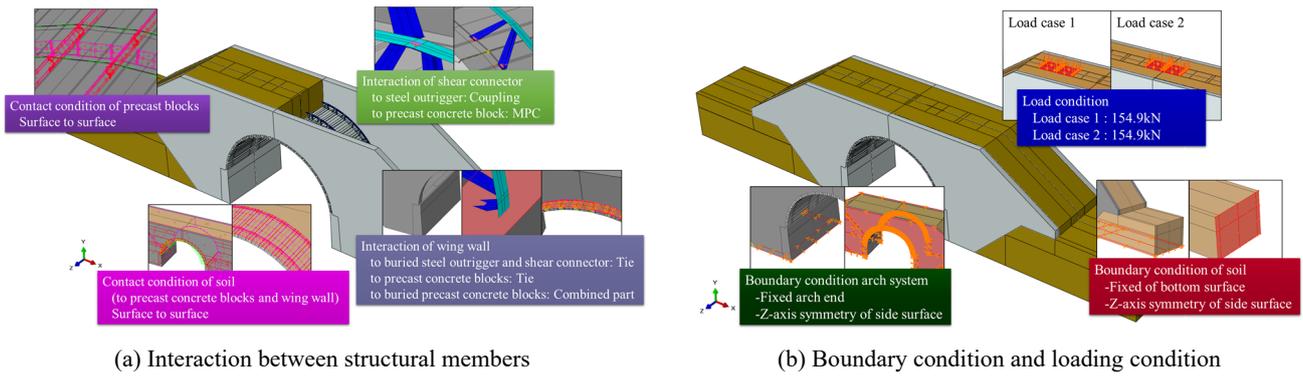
Structural analysis model of modular underground arch culvert specimen
